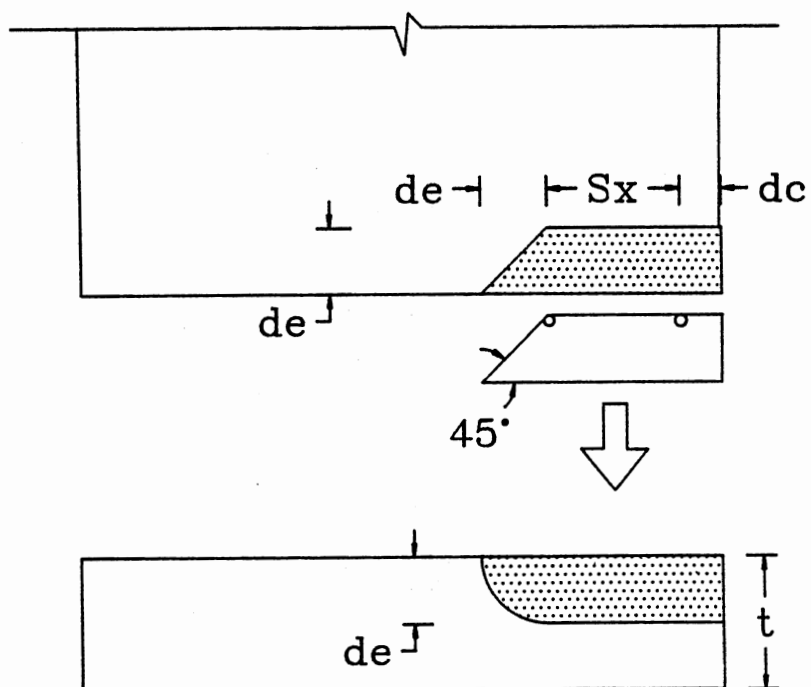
Failure Surface for Type II Specimens Embedded in "Thick" Slabs
